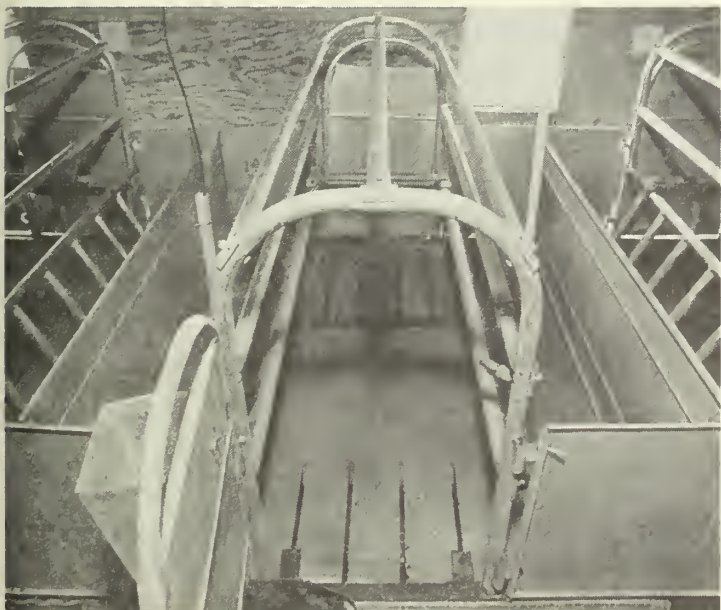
Precast concrete section 5 feet by 7 feet. Rear portion has 1-inch slots 30 inches long spaced at 5 inches. The 1-inch slots are filled with iron bars during and for 24 hours after farrowing. The 1/2-inch slots in front are about 18 inches long.
